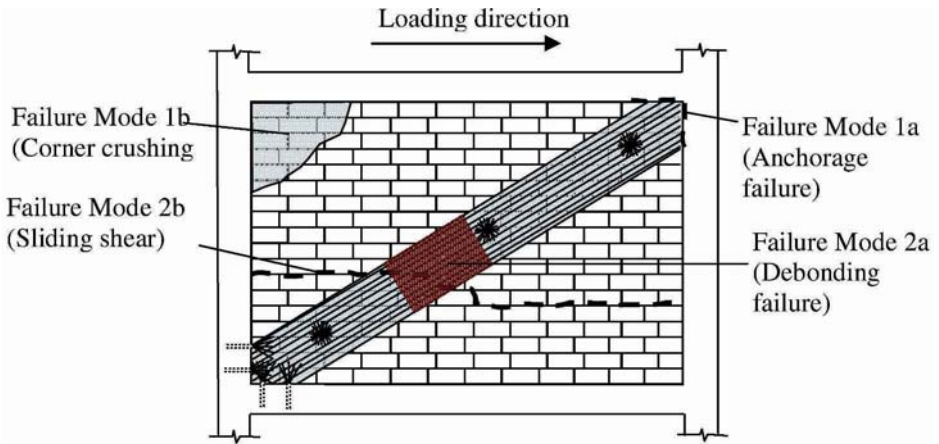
Failure modes of FRP strengthened infill wall in a reinforced concrete frame
